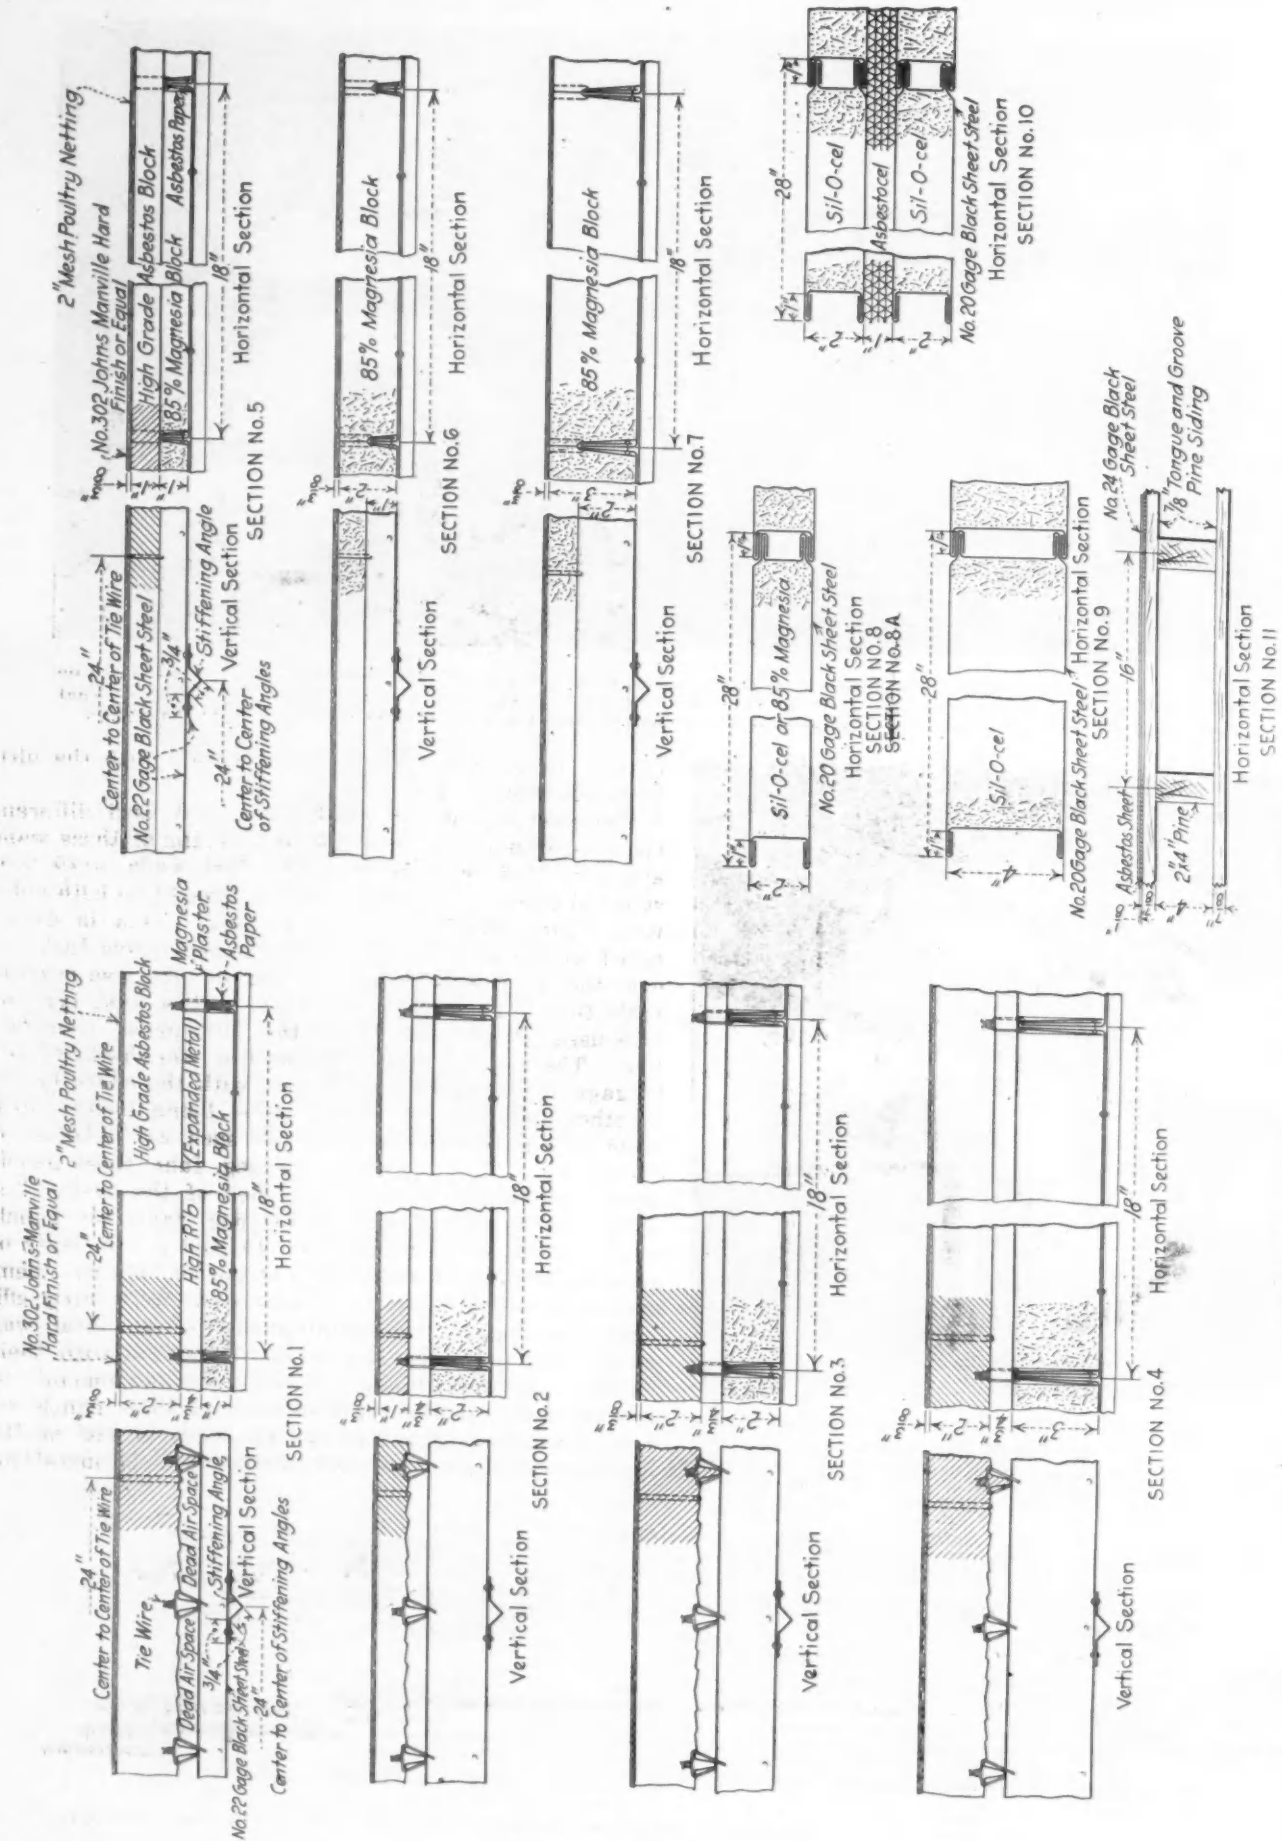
VARIOUS DESIGNS OF OVEN-WALL CONSTRUCTION USED BY CHEVROLET
